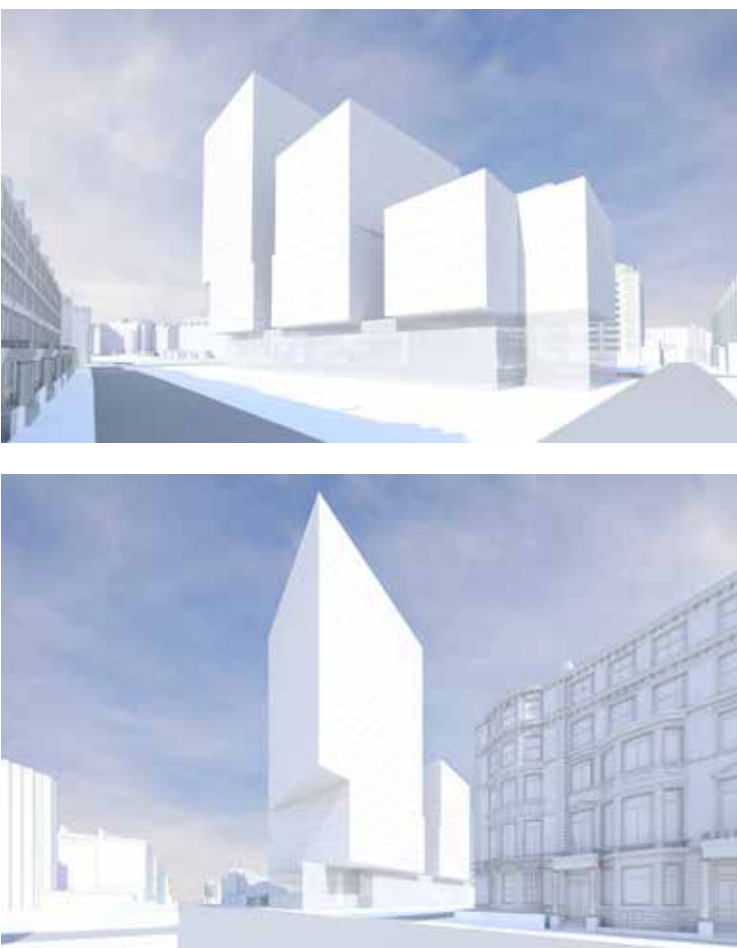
Massing views of the 3 building proposal from corner of Ashburn Gardens and Courtfield Road at the top and from Cromwell Road looking east at the bottom
